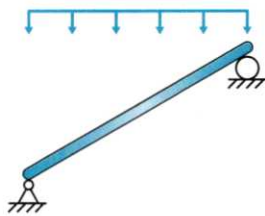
Load acting on the horizontal projection of an inclined structure.
